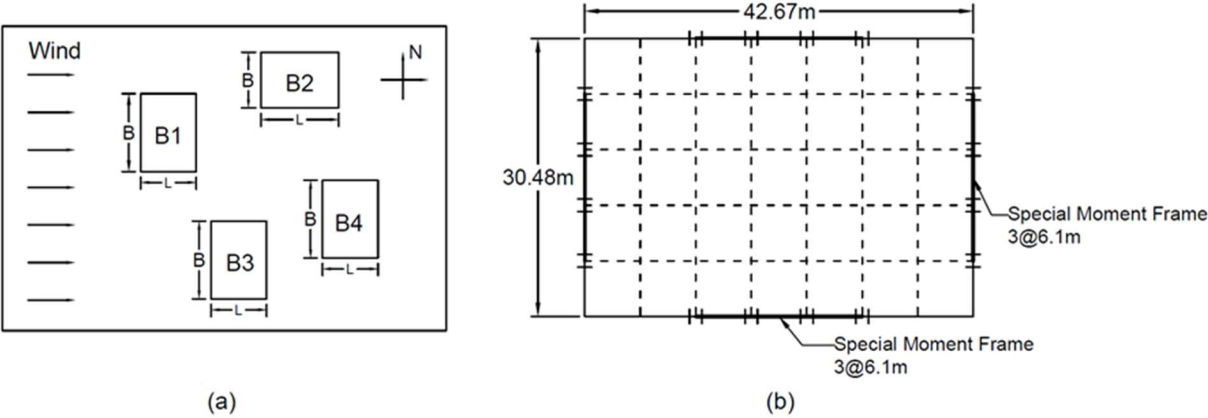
Plan view of: (a) the four building community; and (b) structural layout of each Building
